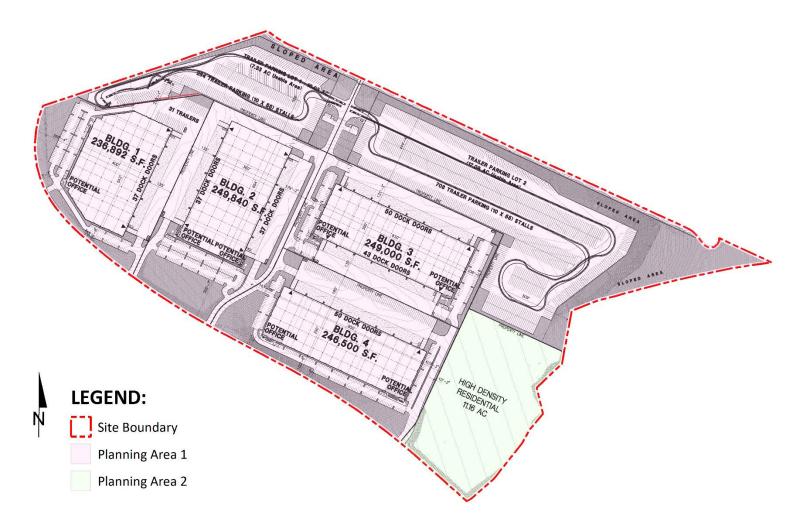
B: CONCEPTUAL SITE PLAN
